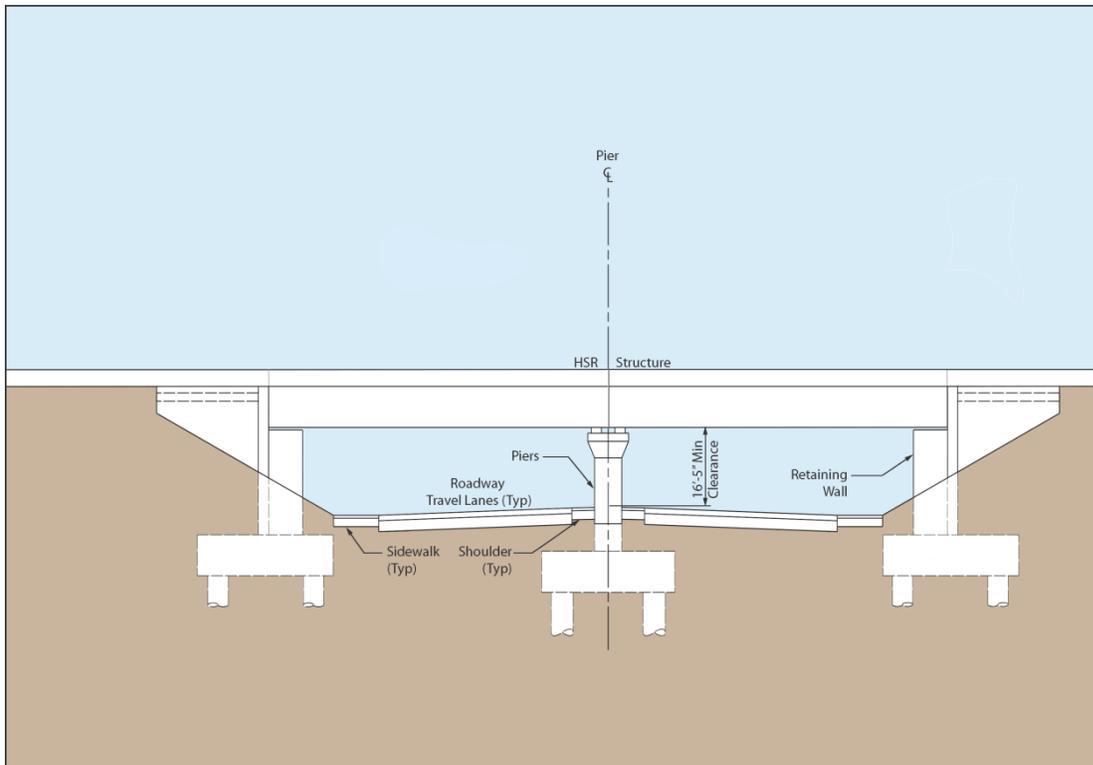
Typical Cross-Section of Roadway Grade-Separated Beneath the High-Speed Rail Guideway
